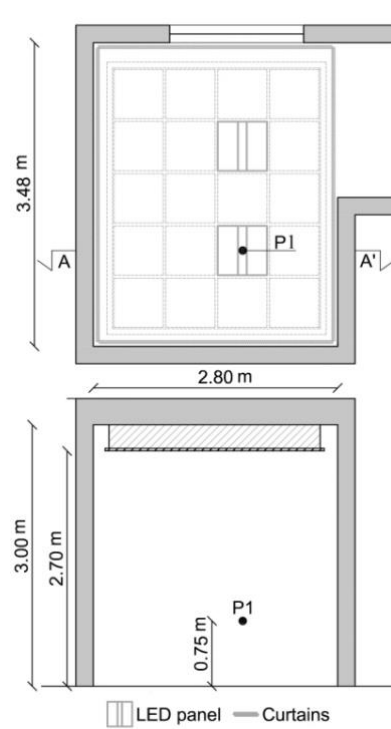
Measured plan and section of the Photometry and Lighting Laboratory where luminaires have been tested in order to know the absorbed power ranges.
